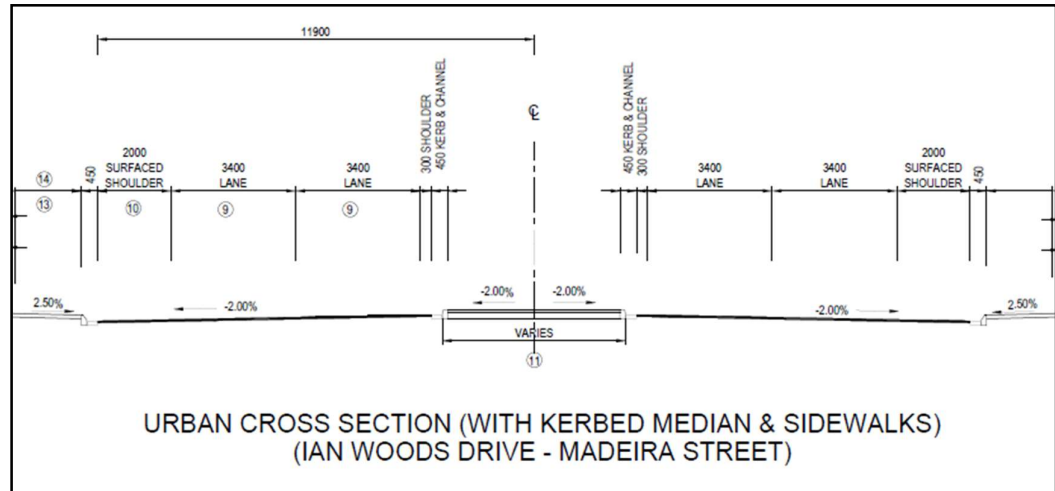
Typical Cross Section for Urban Section from Ian Woods Drive (km 78.3) to Madeira Street (km 85.4)
